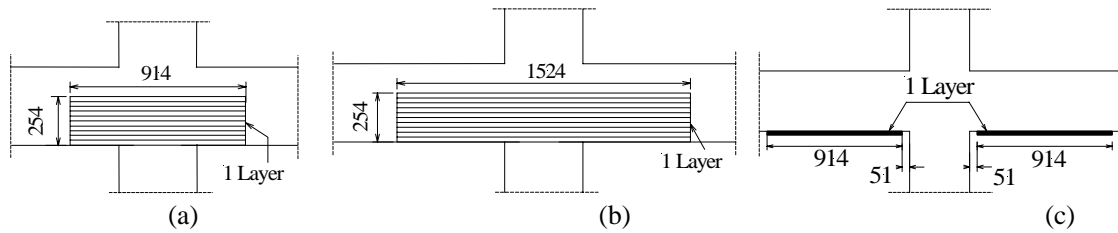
(a) CFRP “lap splice” short bond sheet, (b) long bond sheet, (c) CFRP sheets applied at the bottom surface of the beam.
